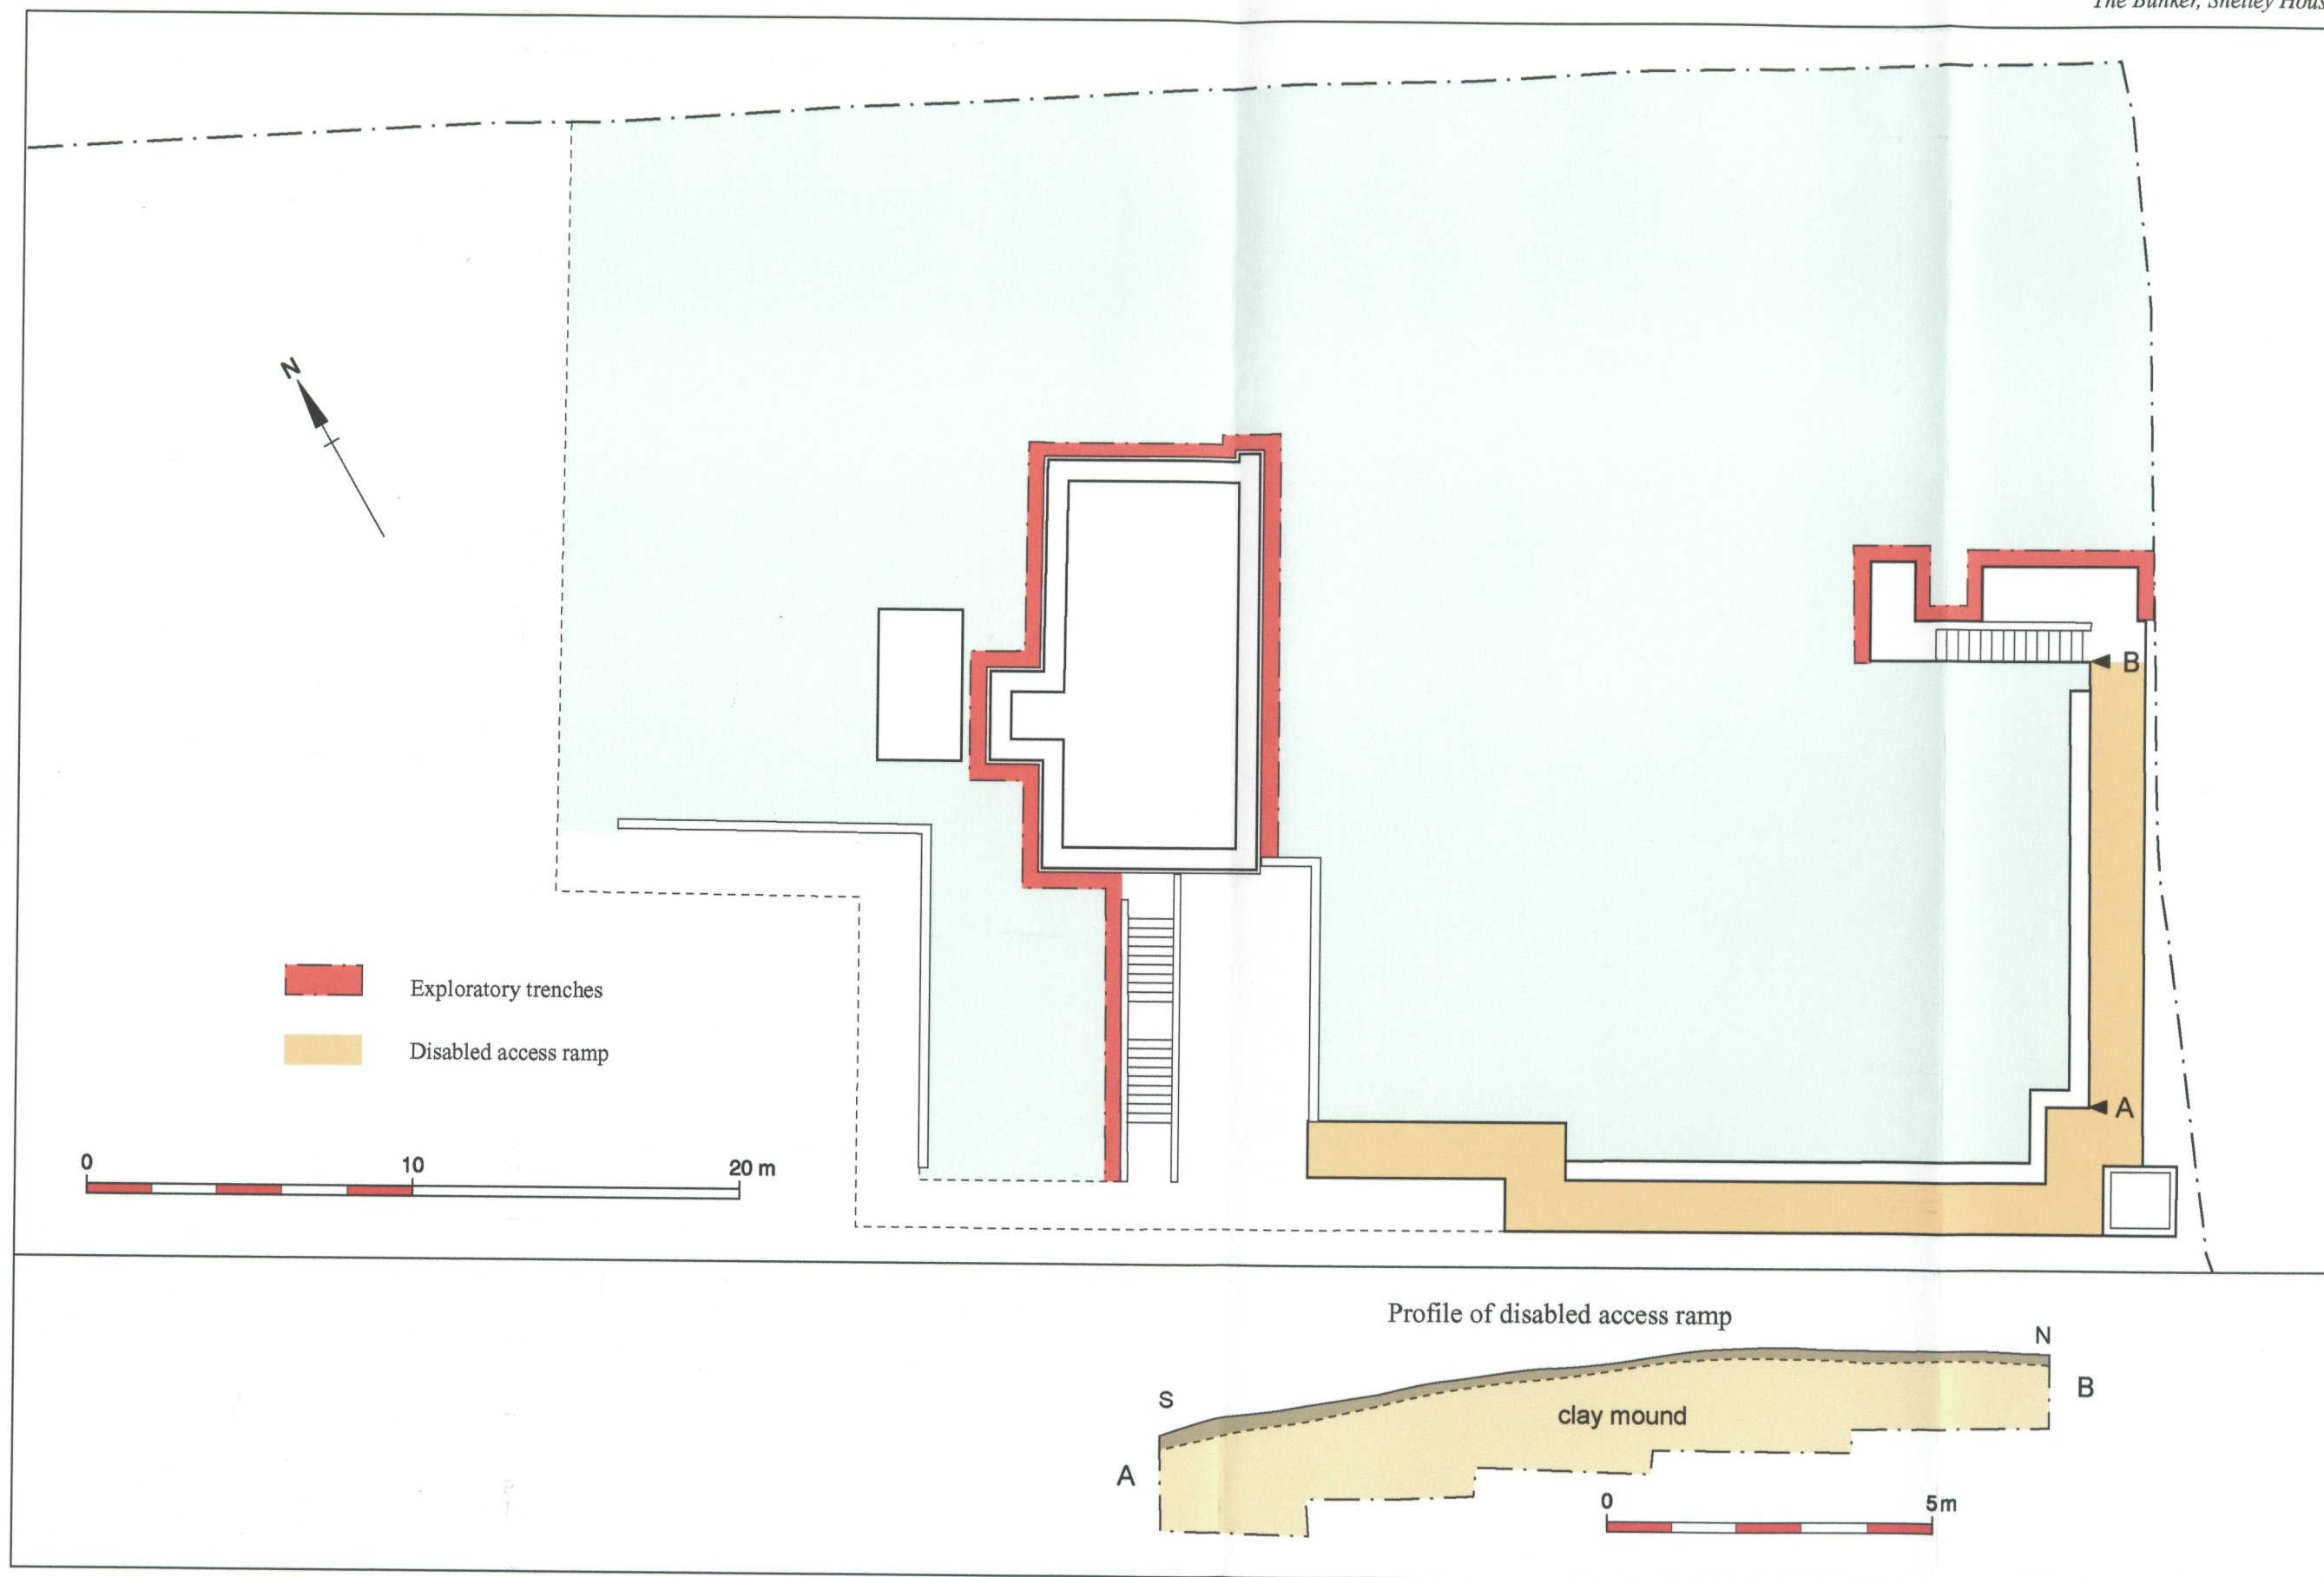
Plan of exploratory trenches and profile of disabled access ramp
